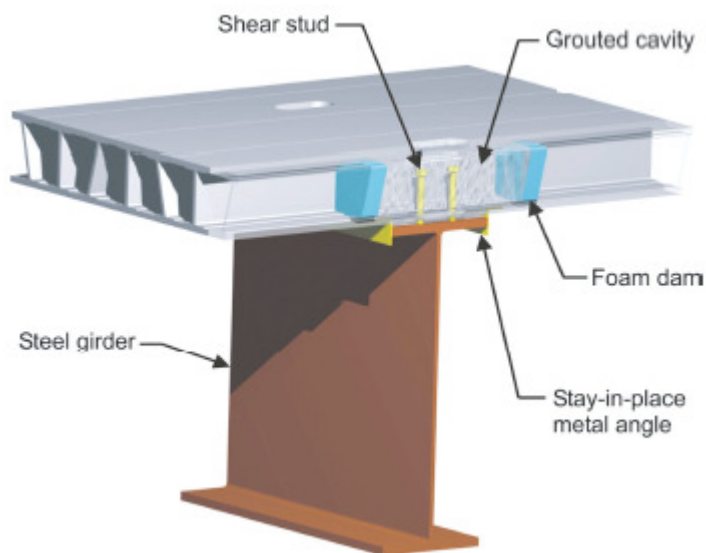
The FRP deck panel was attached above steel girder with shear stud. (Matt Sams)
